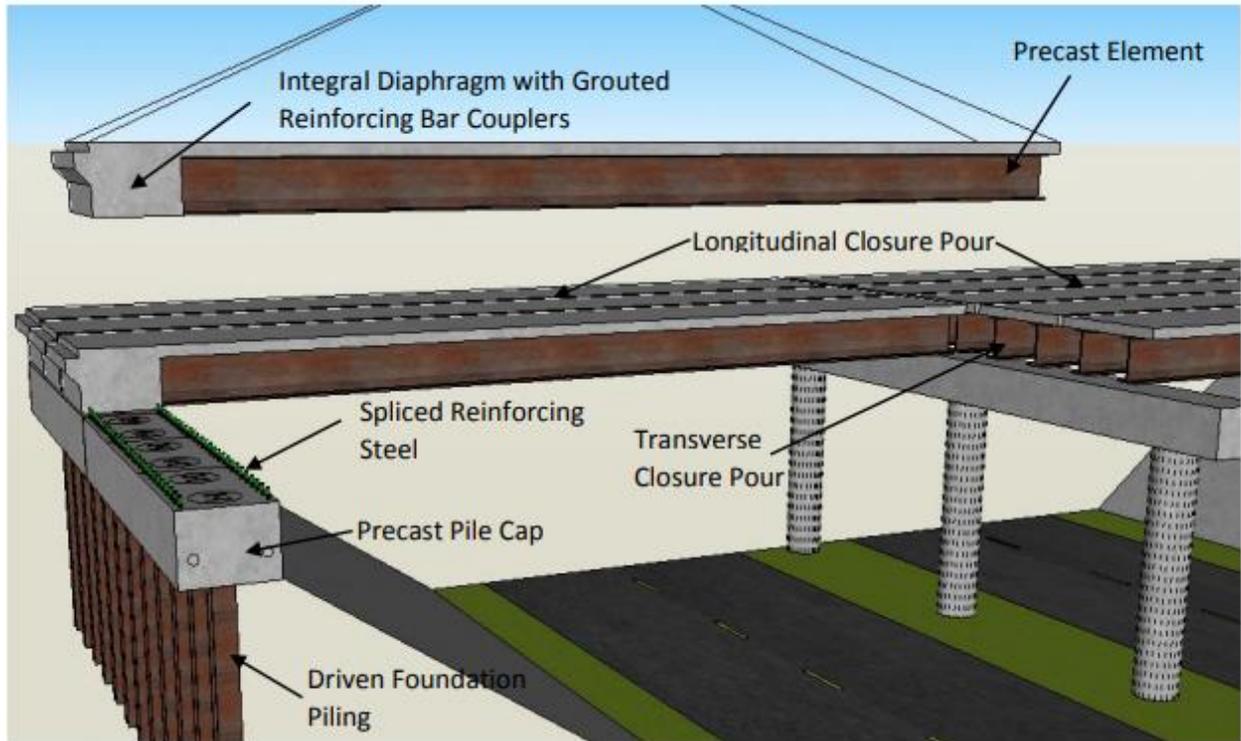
Grouted couplers connection in prefabricated abutment [42]
